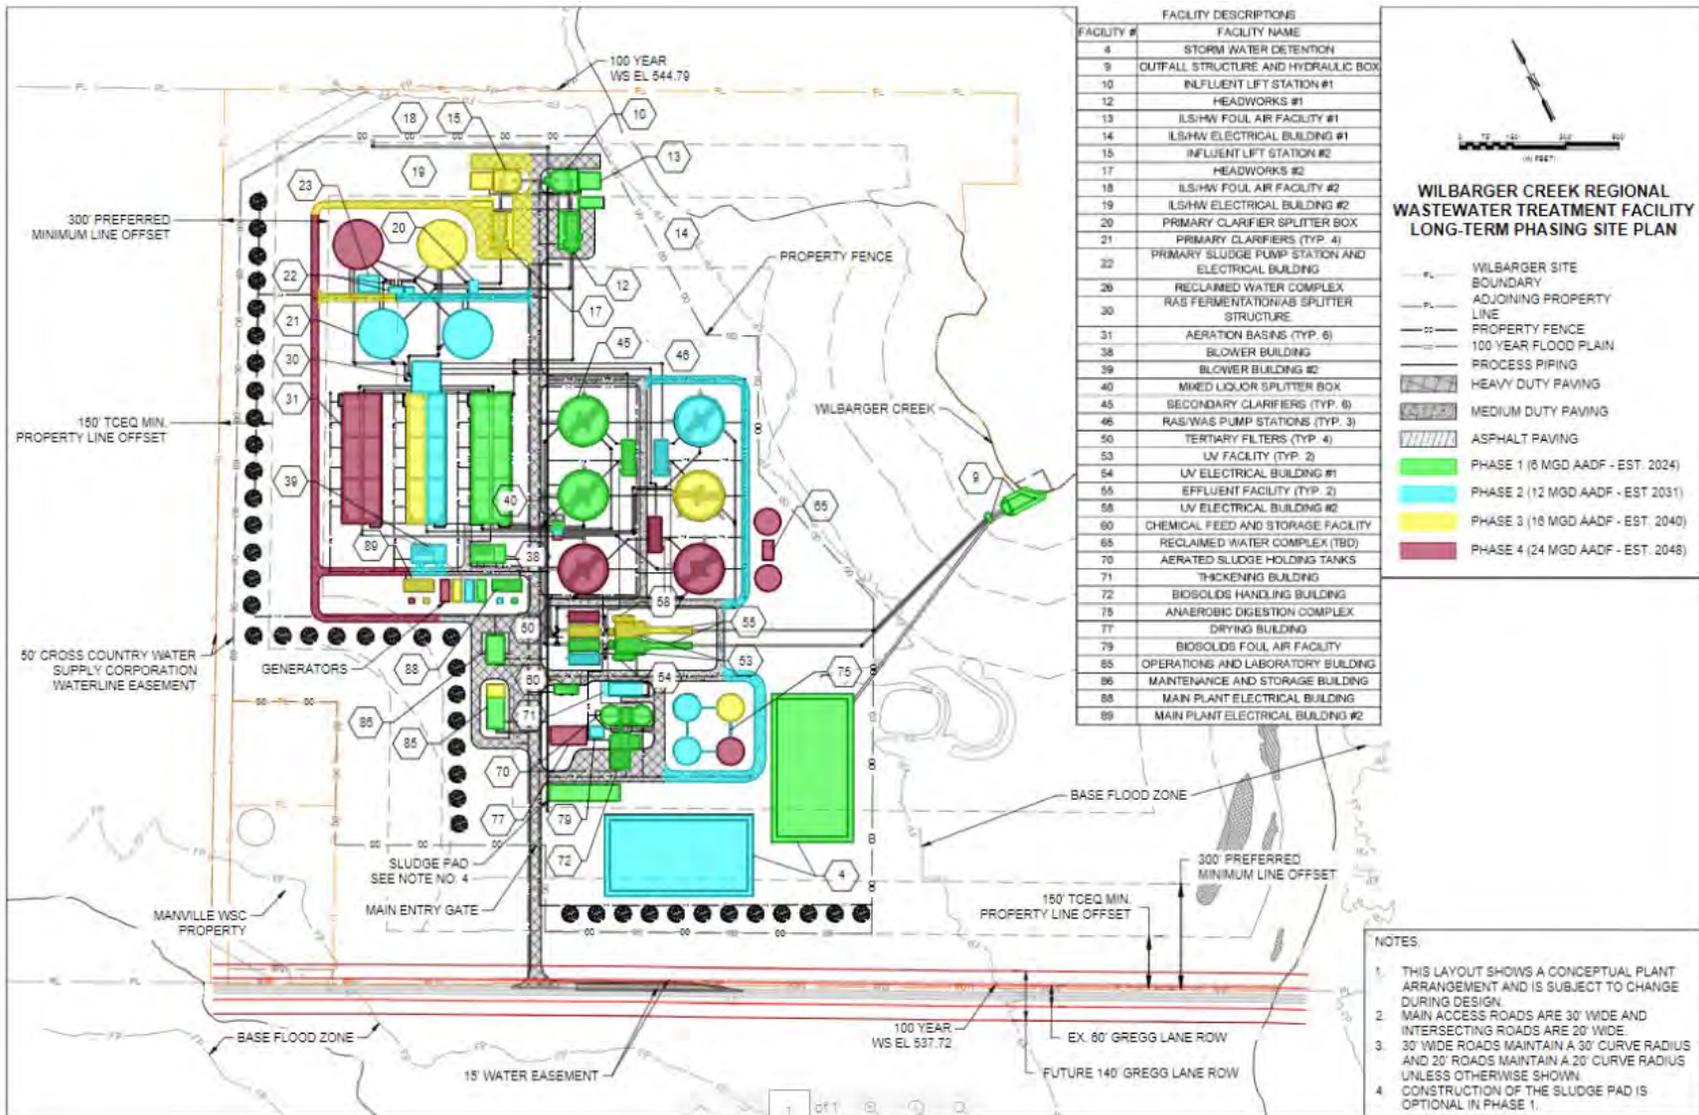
Wilbarger Creek RWWTF Phasing Plan
